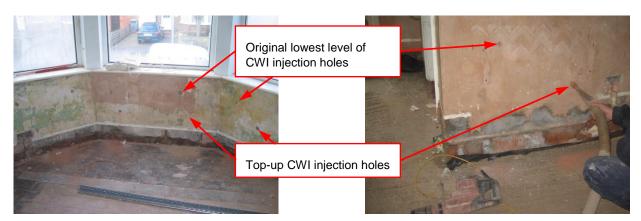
Top-up CWI at the ground floor bay and internal rear cavity wall.
